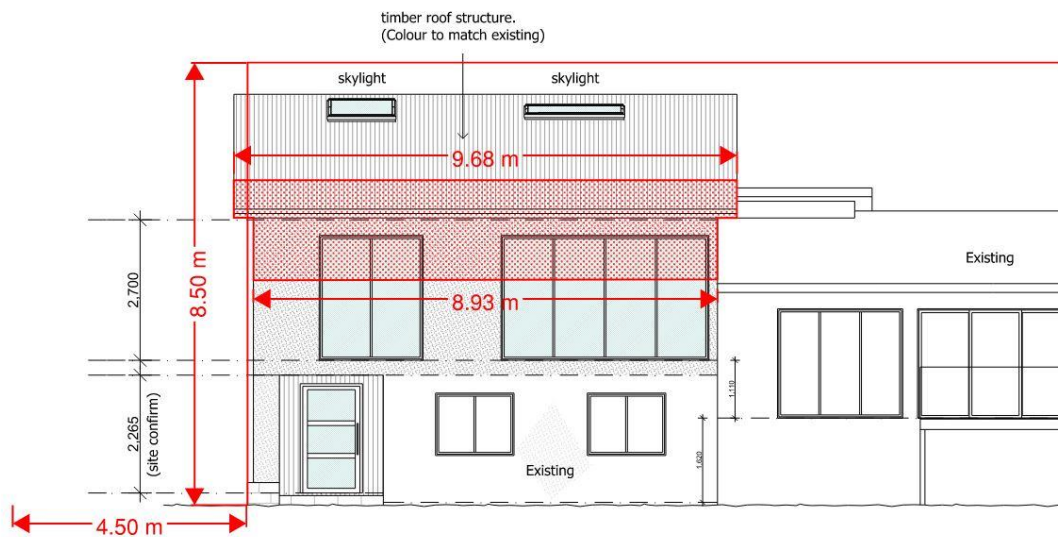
Eastern Elevation of dwelling showing part of dwelling beyond the building envelope (marked and hatched in red)
